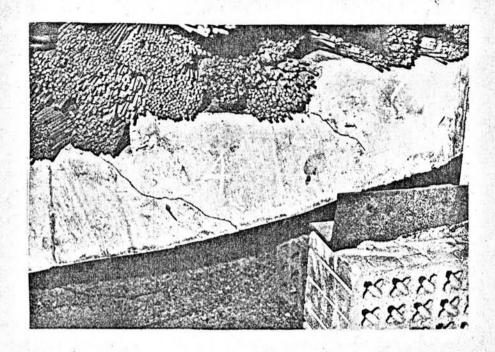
View of torsional cracks at the outer side of the stairs
